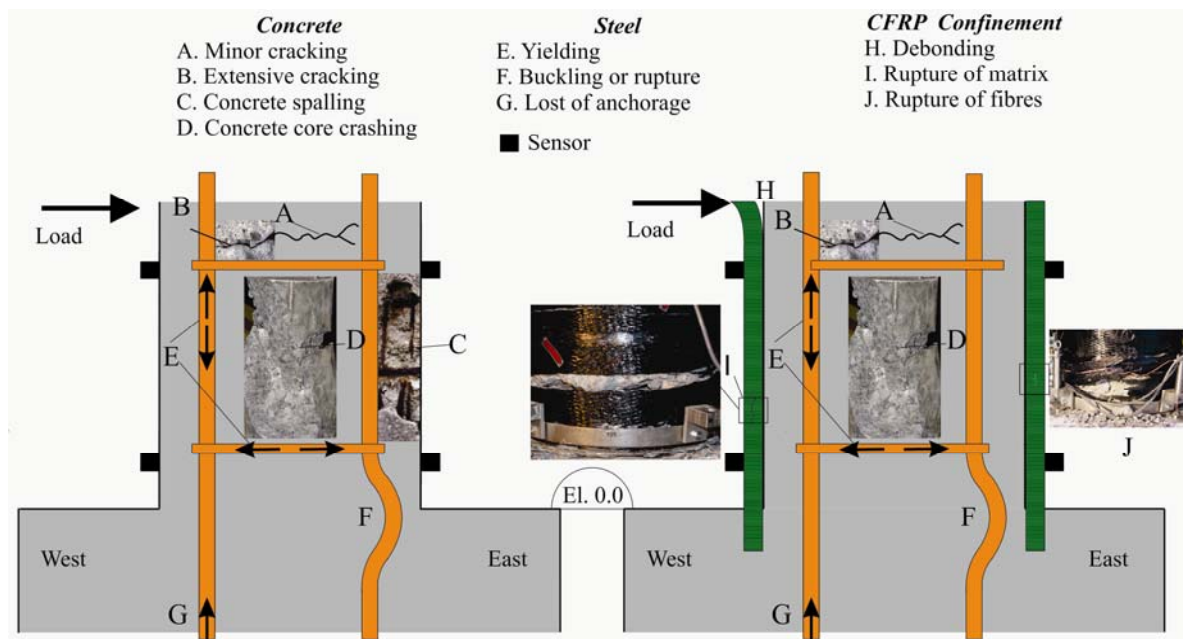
(a) RC column damages and (b) RC column confined with CFRPs damages
